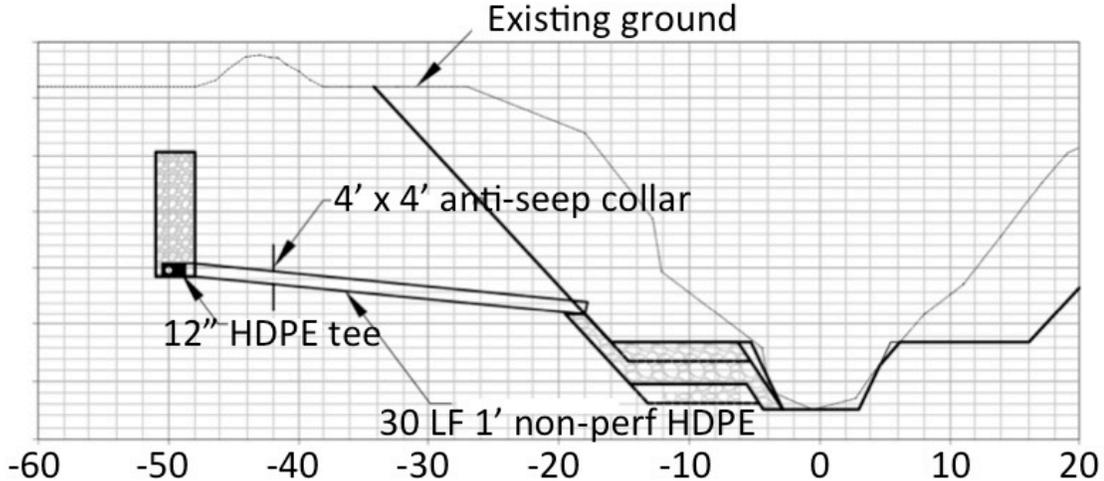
Two-Stage Channel Cross-Section Showing the Seepage Trench. Dimensions of the Axis are in Feet and Inches. Drawing by Joel Peterson.
